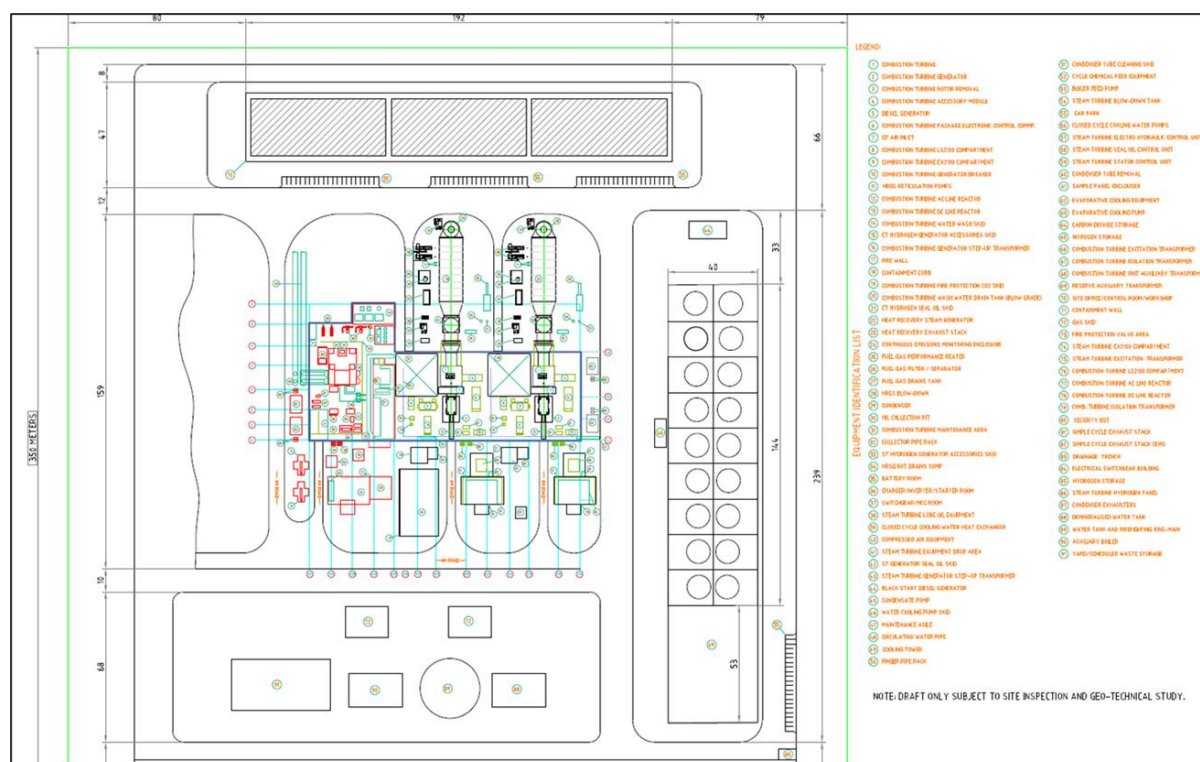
Conceptual layout of the proposed CCGT Power Plant.
